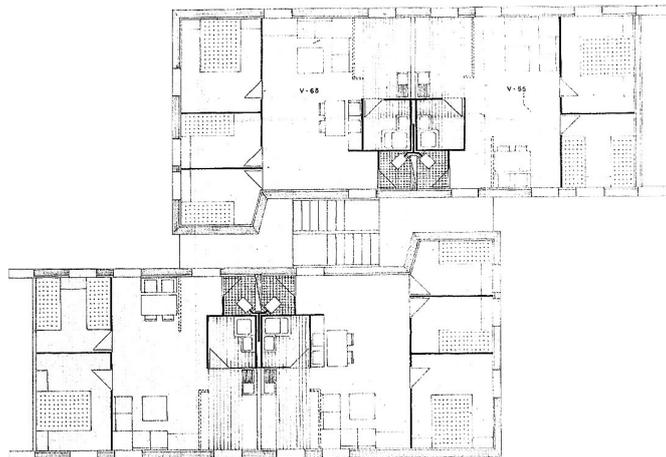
Loyola's* housing blocks with two types of dwellings. Floor plan (1960).
